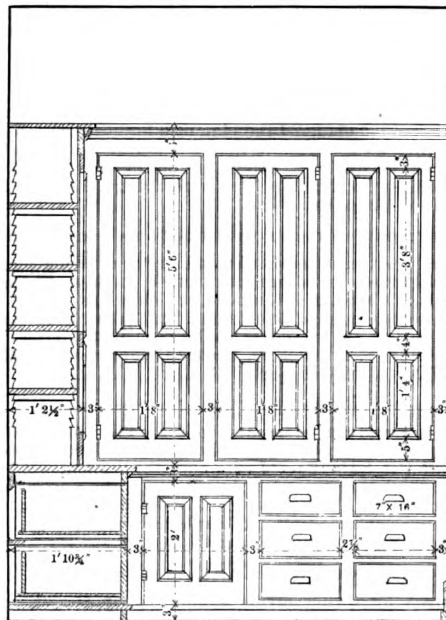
Elevation in Pantry, Looking Toward the Dining Room.—Scale, $\frac{3}{8}$ Inch to the Foot.
